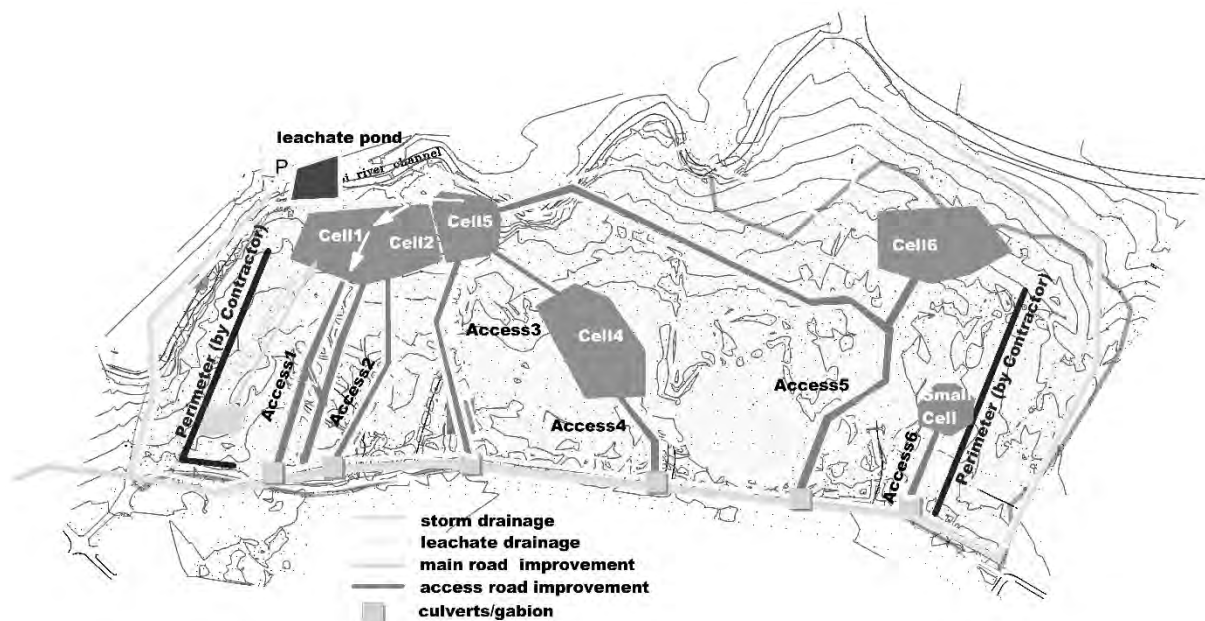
Layout Plan of Dandora Dumpsite in Phase 4
